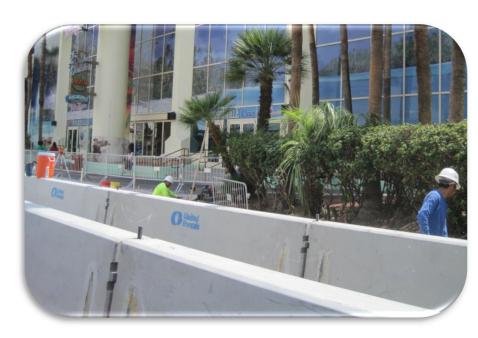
Venetian Hotel/Casino Walkway Construction.
